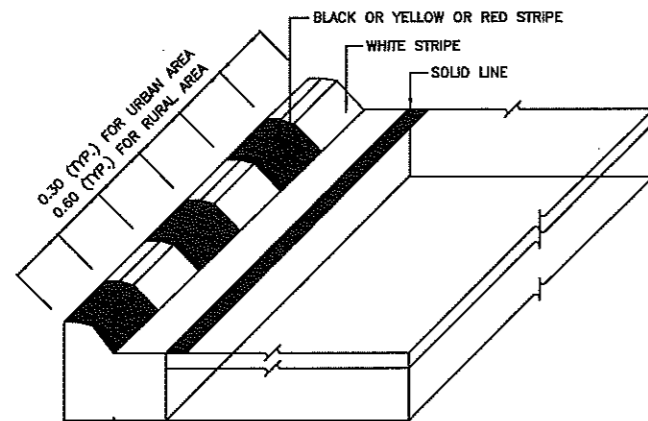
DETAIL OF CURB AND GUTTER OR CURB AT RAISED MEDIAN
